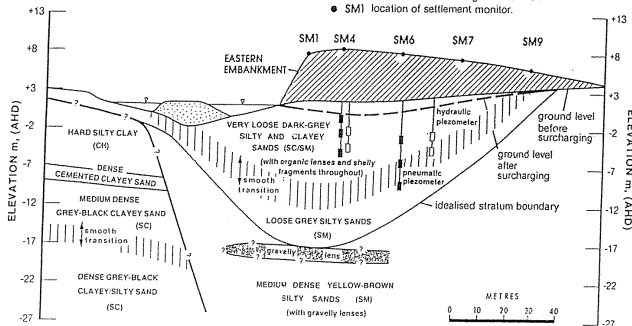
Idealised Ground Profile Along Proposed Bridge Centreline.
